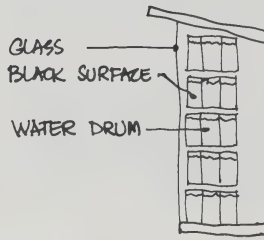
'DRUM WALL' COLLECTOR/STORAGE
